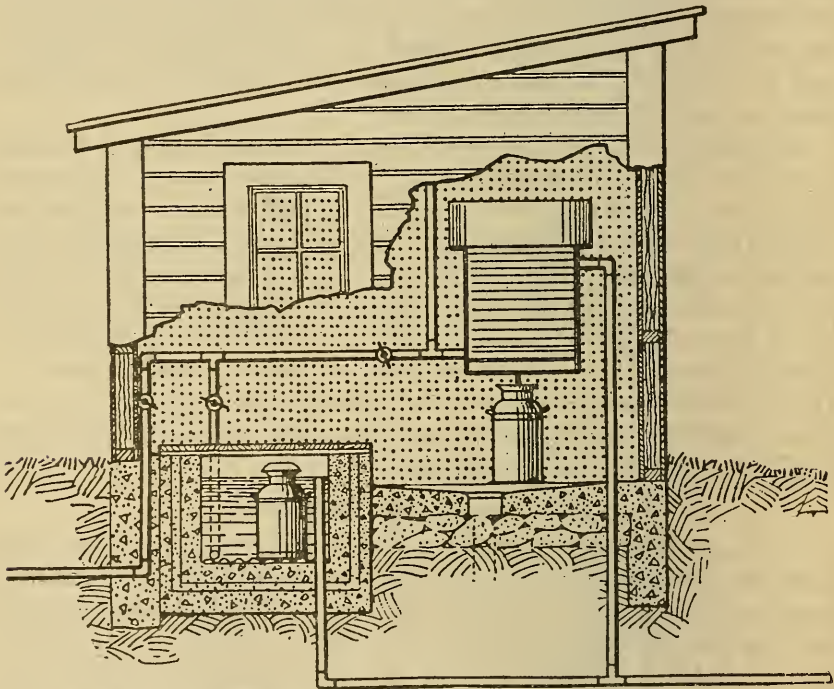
Arrangement of concrete-insulated cooling tank built partly below ground level.
